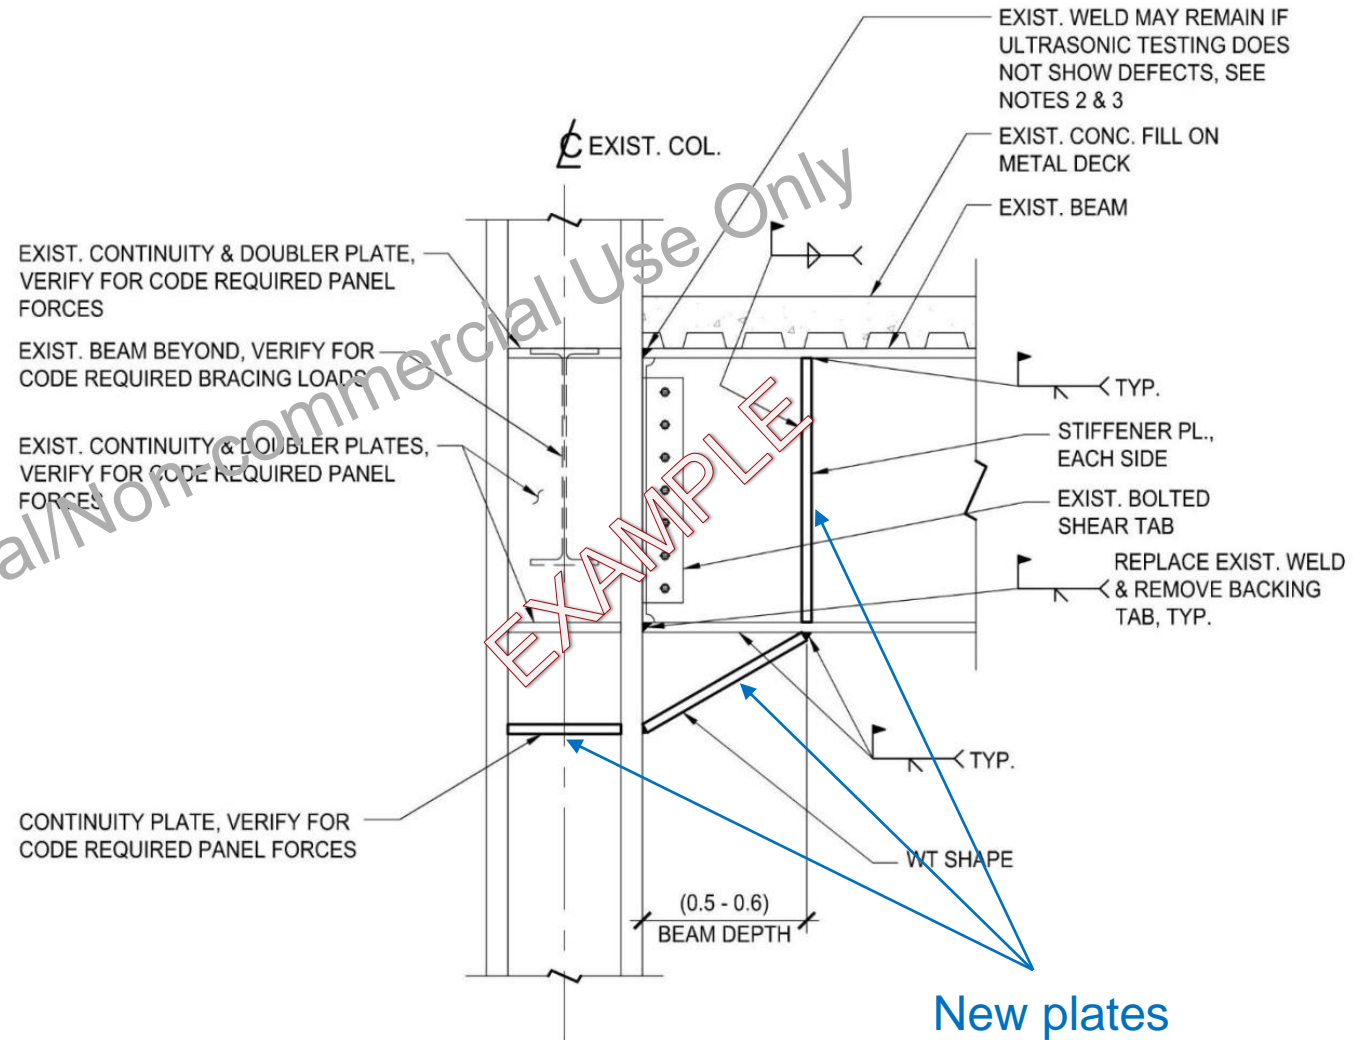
Welded haunch added to bottom flange of existing moment frame beam
